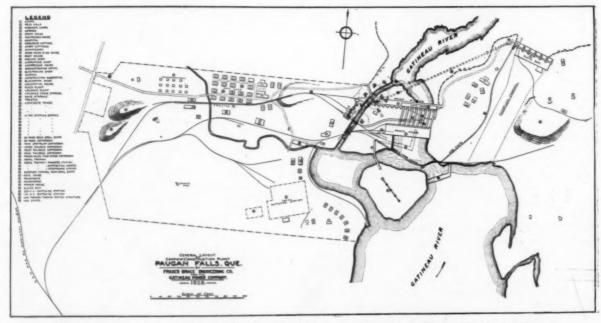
Layout of the Camp and Construction Plant at the Paugan Falls Hydro Electric Development
